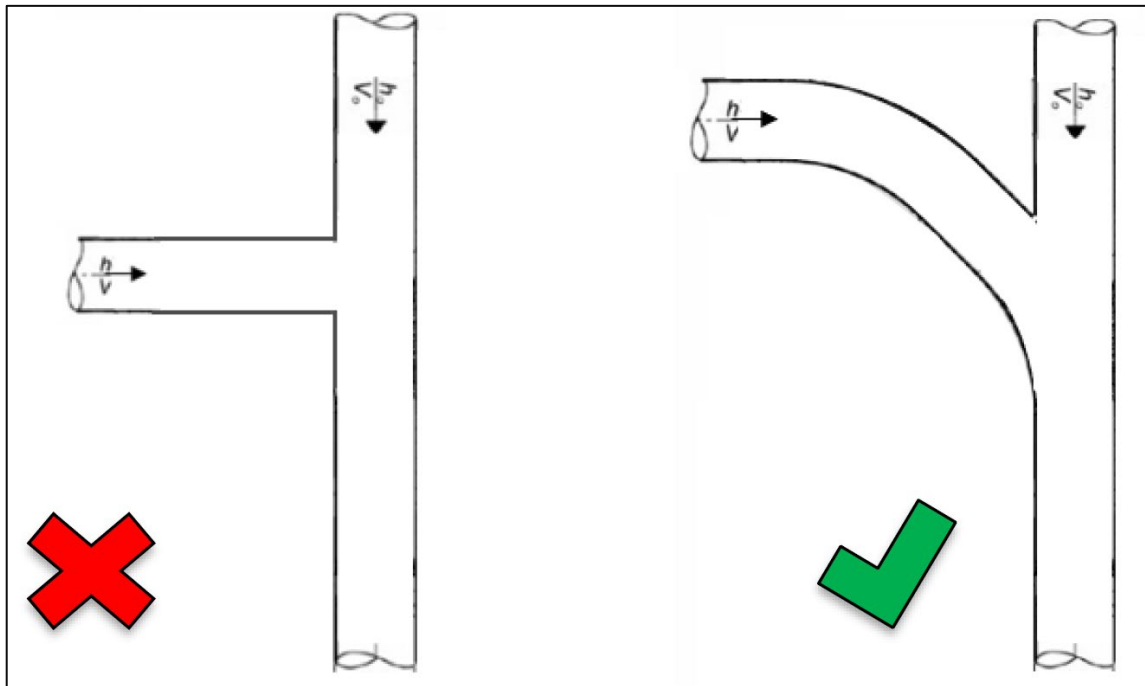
Streamlining branch sewer connections on trunk mains
